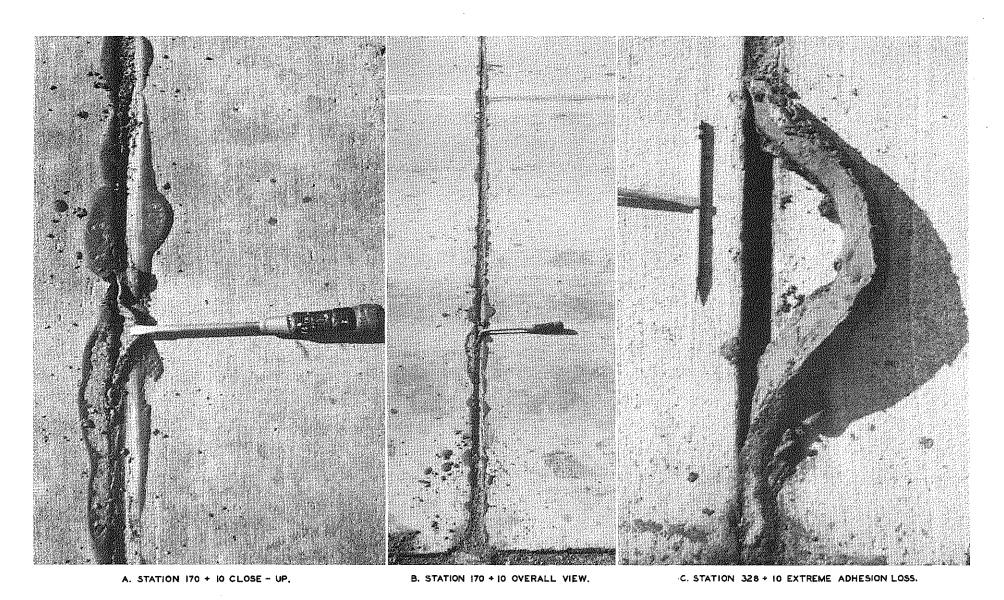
FORMED CONTRACTION JOINTS PROTECTED WITH JUTE ROVE PRIOR TO SEALING WITH HOT-POUR RUBBER-TYPE JOINT SEAL. SEALER LACKS ADHESION BUT LITTLE OR NO SAND WAS FOUND UNDER JOINT SEAL.
